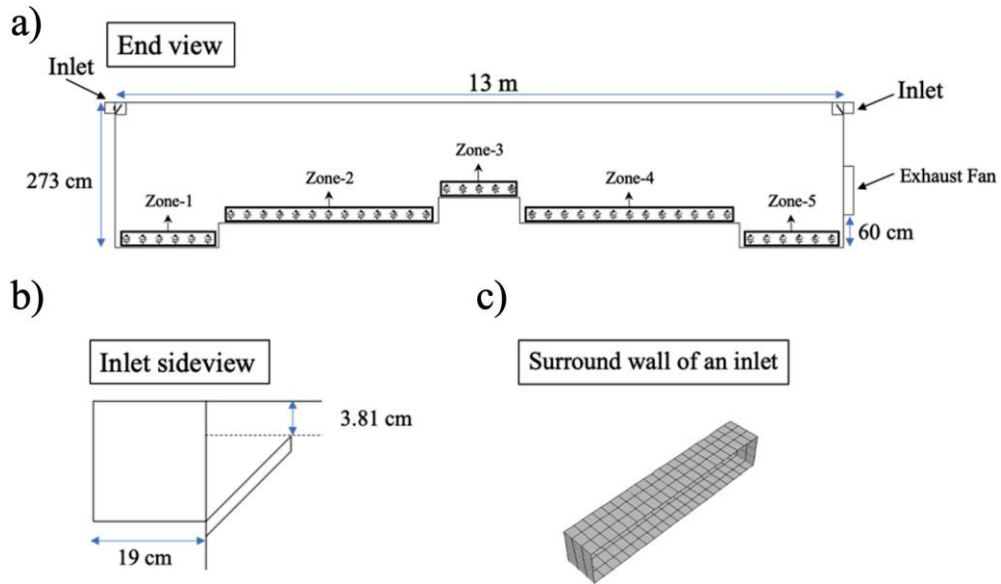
Illustrations of a) the end view cross-section of study hen house including five bird-occupied zones, b) the side view of an inlet showing the opening size and wall thickness, c) surrounding walls of an inlet showing the area where viruses were introduced.
